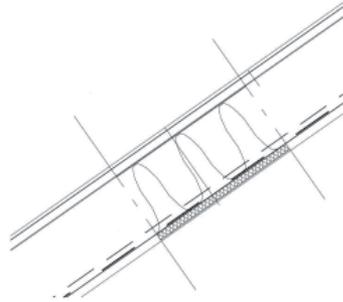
Roof in building with 2.5 storeys (Drawing: bsv arkitekter).
